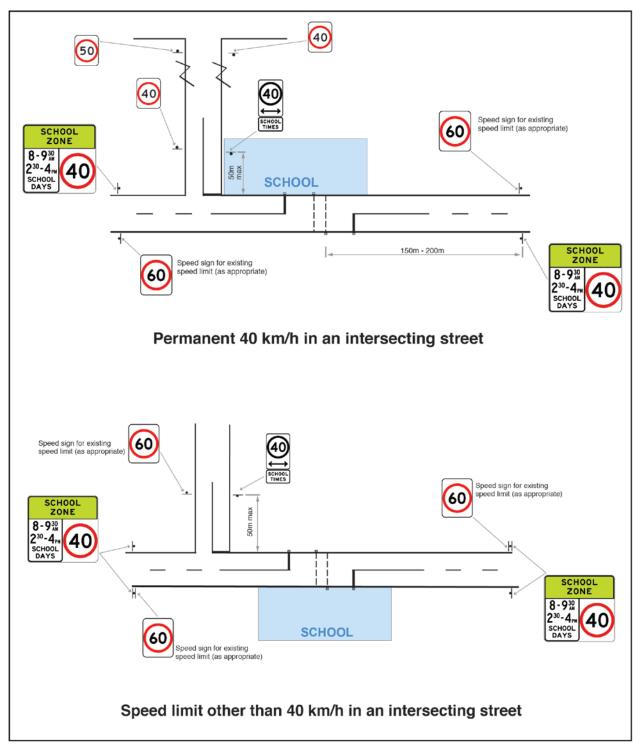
School speed zones – examples of sign layouts in intersecting streets
